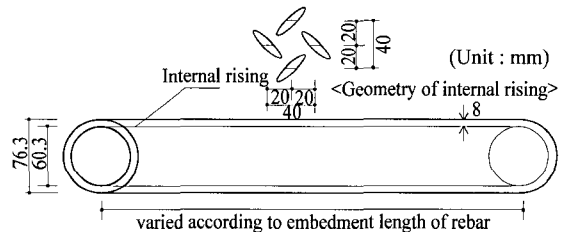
Section of pipe splice sleeve used in test of Suzuki (D35 rebar)
